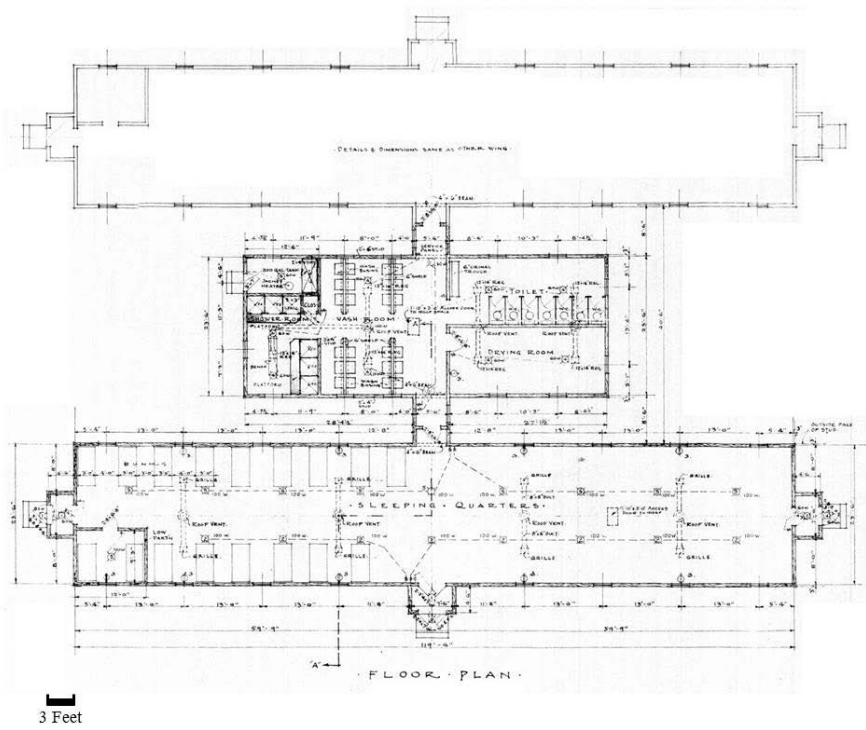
RCAF generic architectural plan, floor plan detail. Note how the two wings are connected through the shared bathroom area. (Courtesy of the Commonwealth Air Training Plan Museum)
